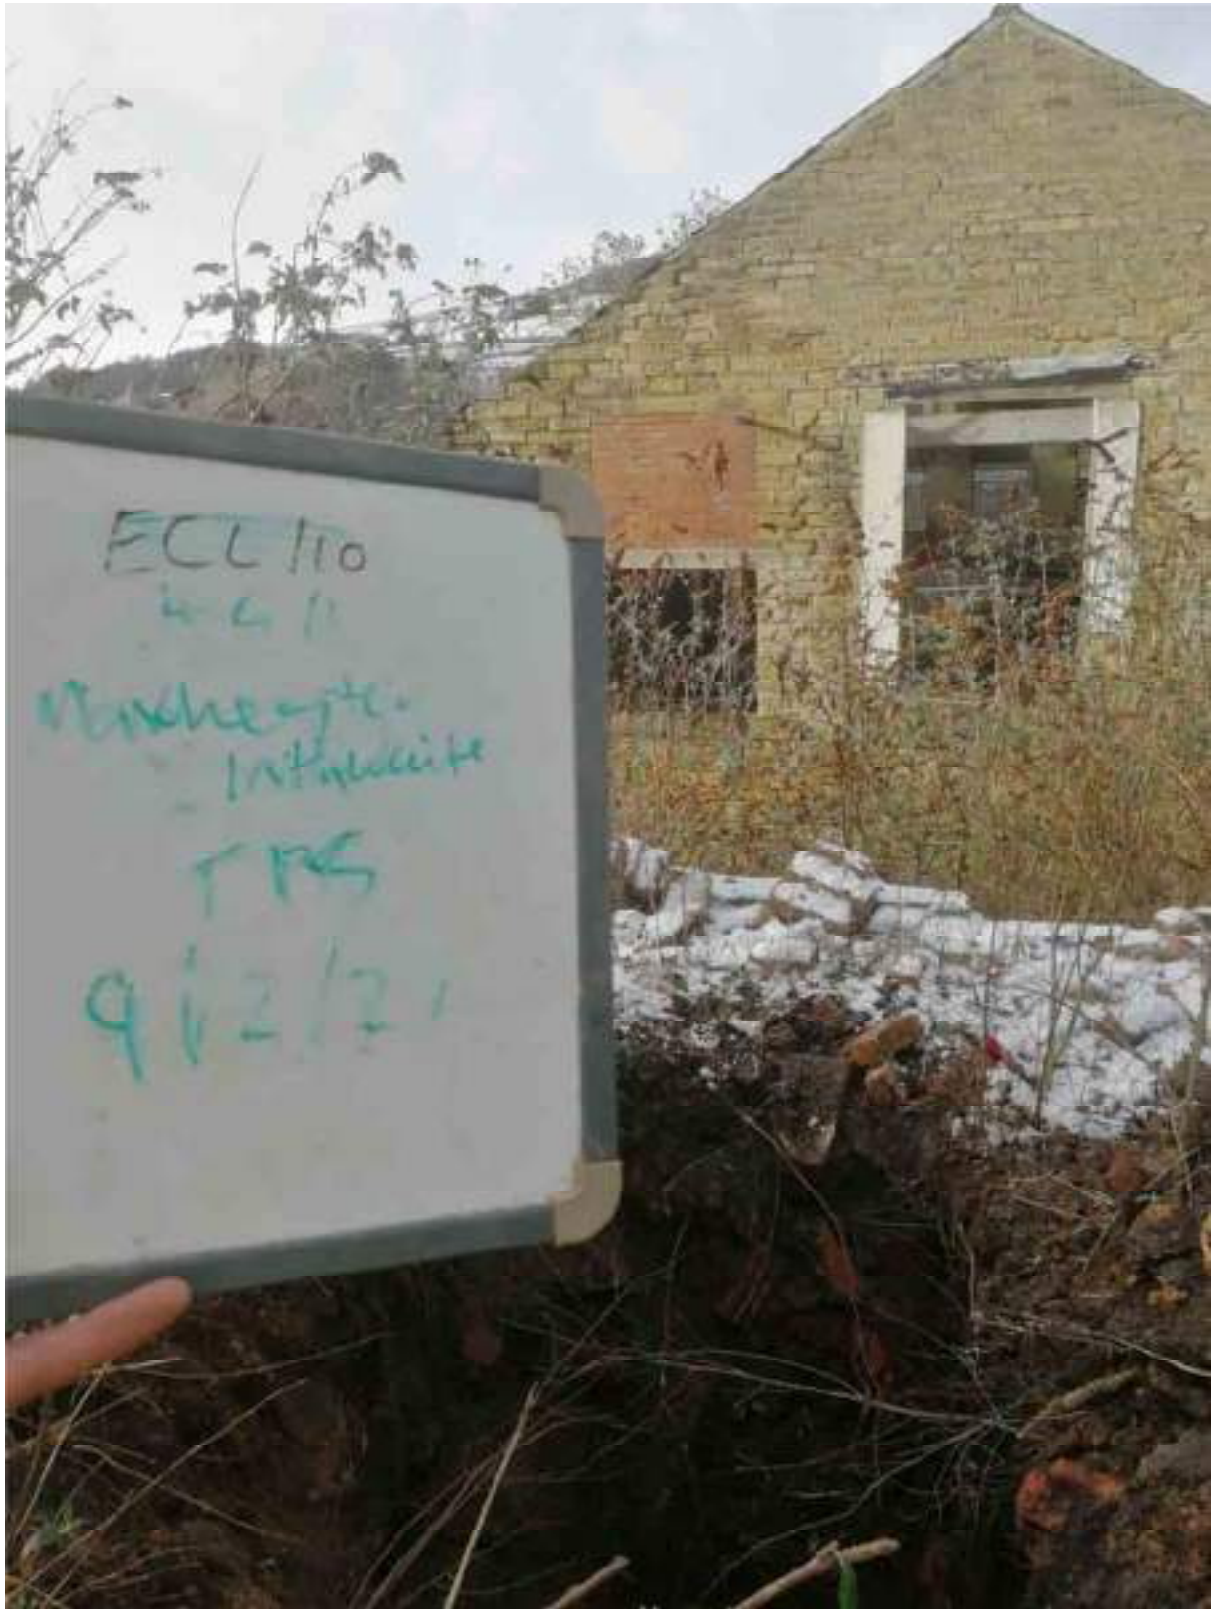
Location of TP7 undertaken to expose foundations of brick retaining wall in photograph 6.
